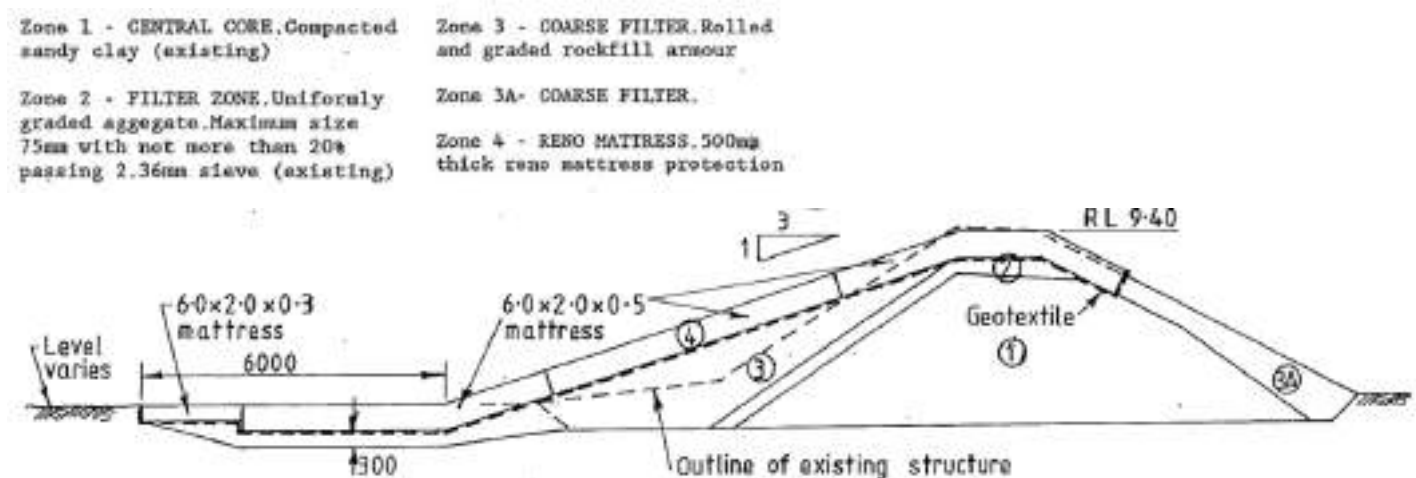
Typical spillway section (extract from proposed rehabilitation plan)
